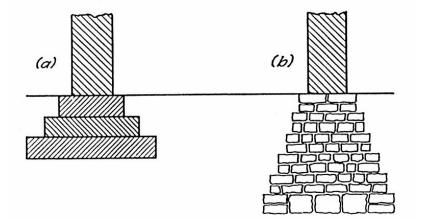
(a) TYPICAL FOOTING OF DIMENSION STONE; (b) RUBBLE STONE PIER
